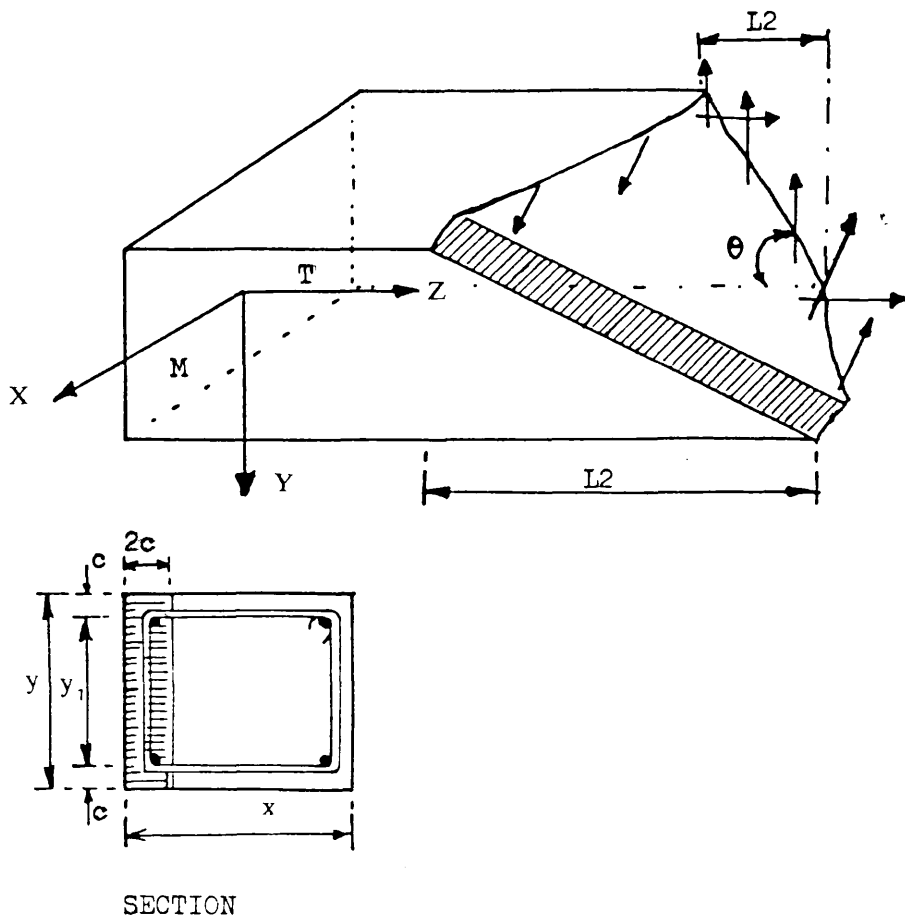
b Failure Surface for Combined Torsion and Bending in Skew bending approach. (Torsion dominated)
